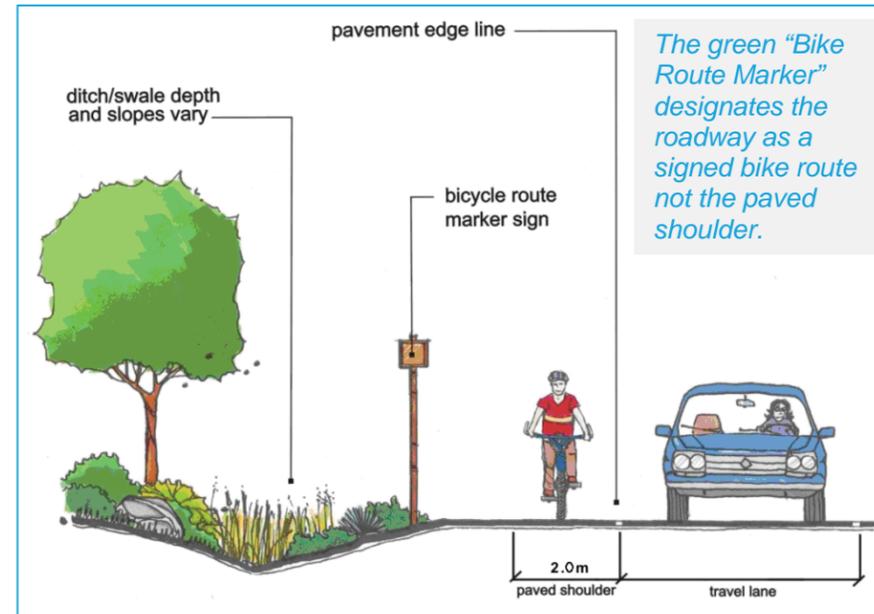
Typical Signed Bike Route with a Paved Shoulder Schematic
